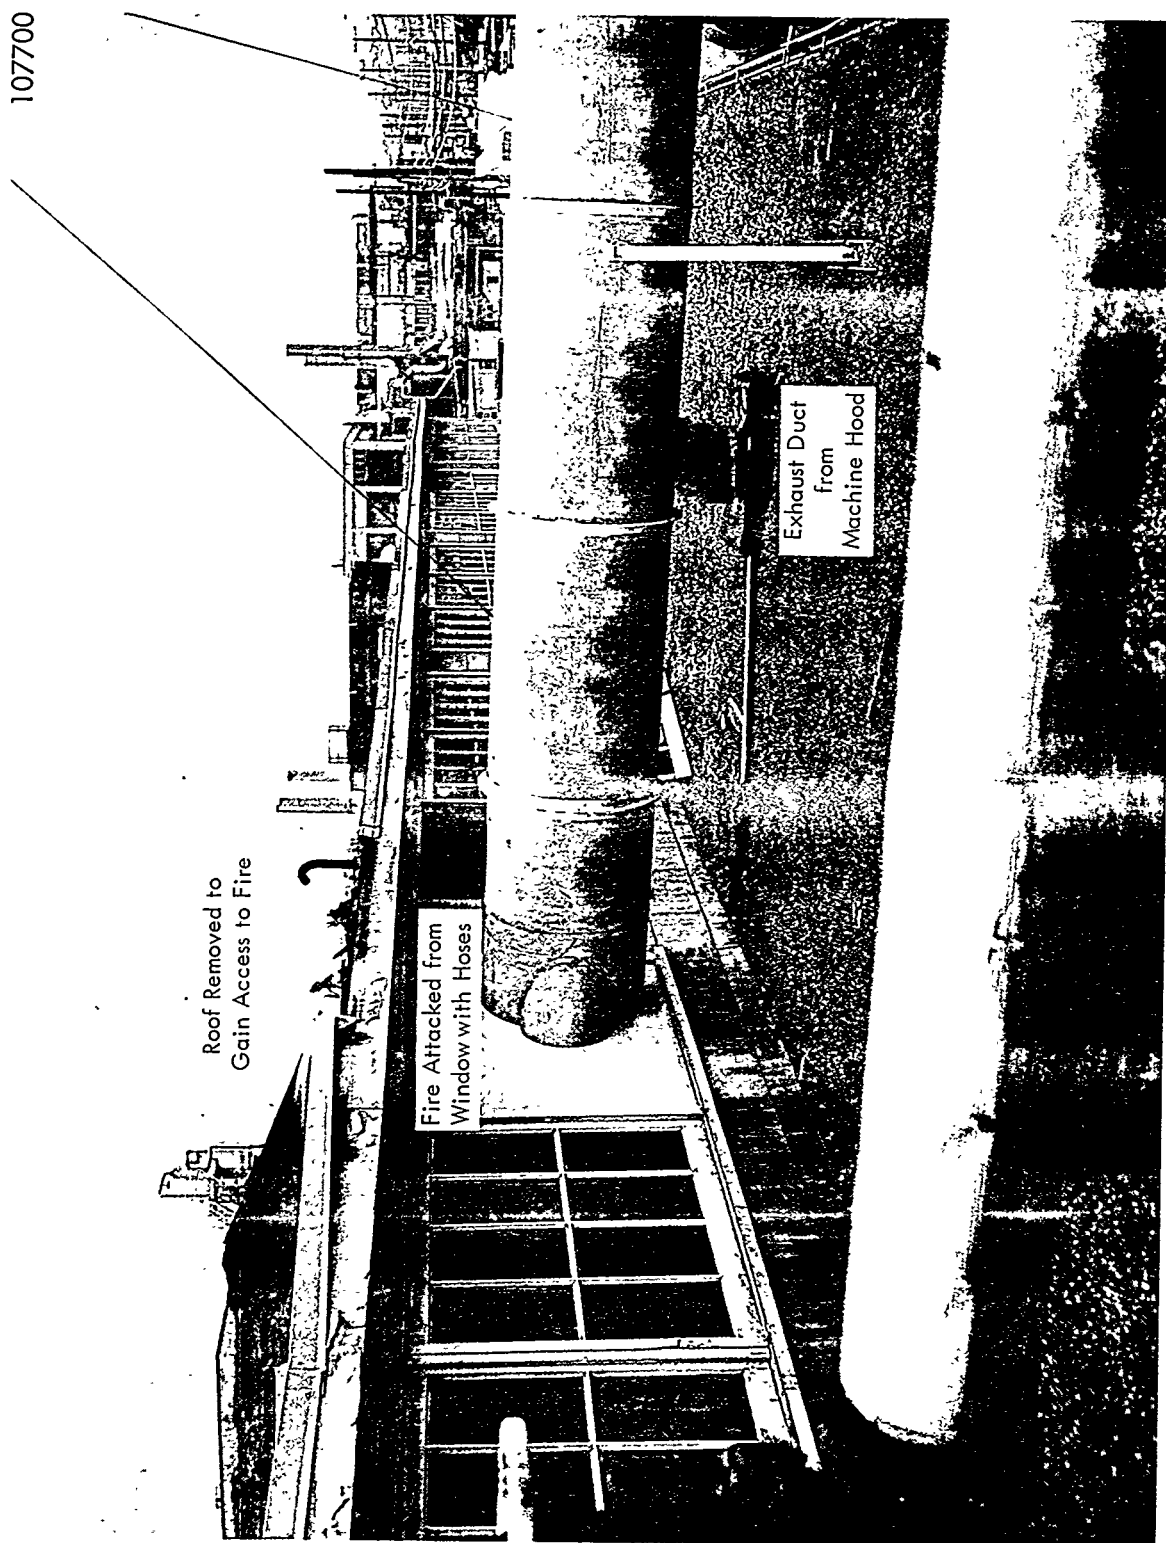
EXTERIOR EXHAUST DUCT FROM MACHINE HOOD.
